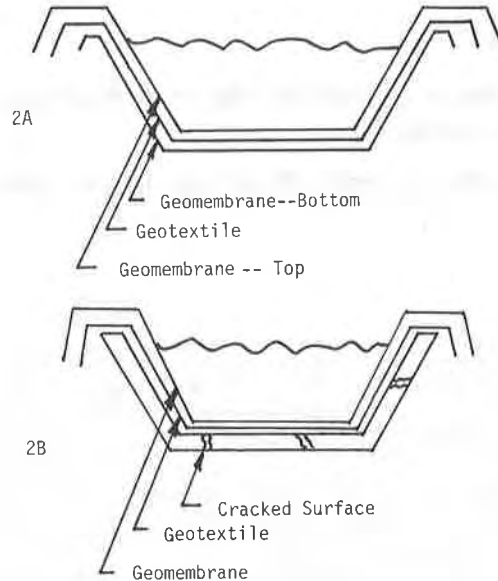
Installation of Geotextile in (A) Double-Lined Pond and (B) Rough Surfaced Pond.
